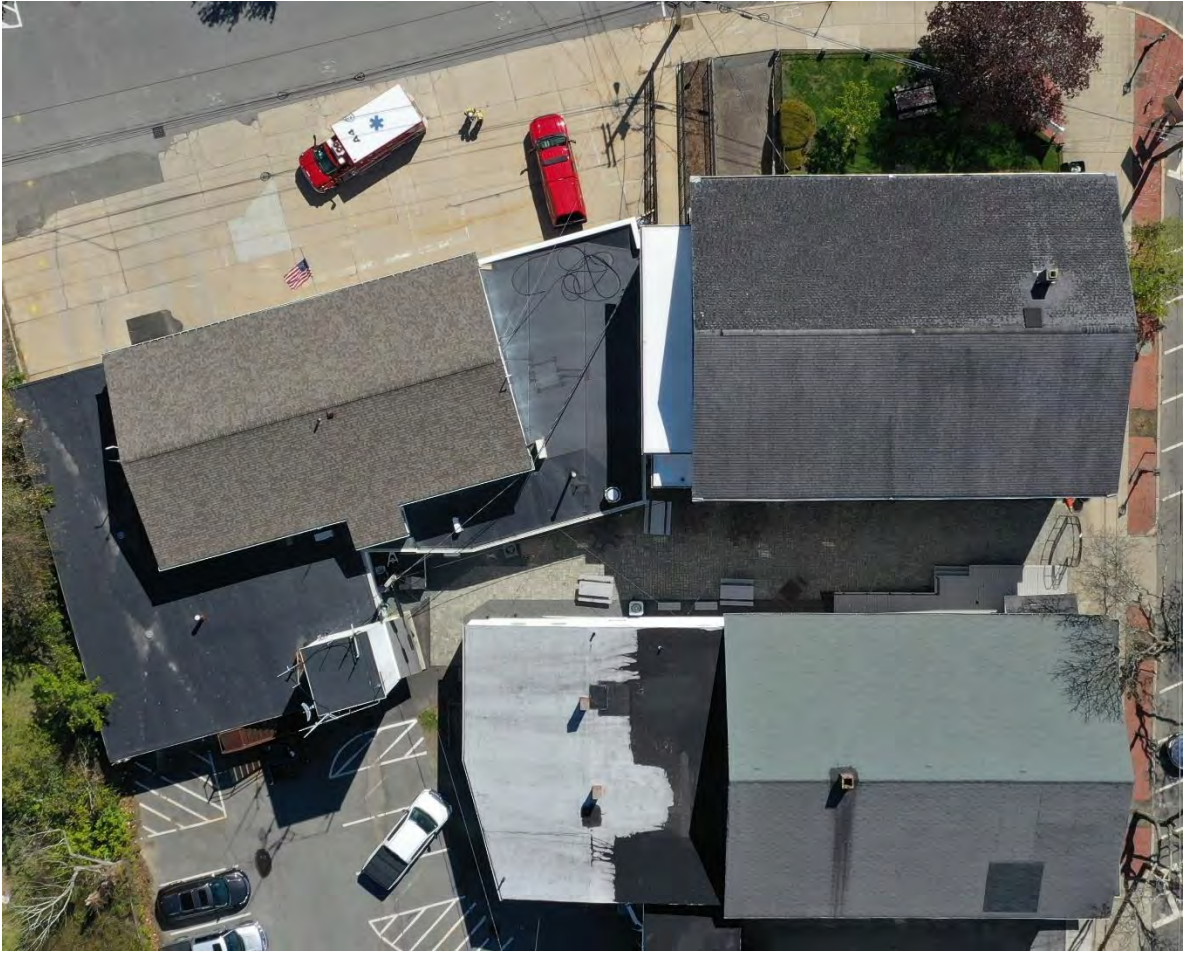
Aerial Plan View of Town Hall and Adjacent Buildings.
